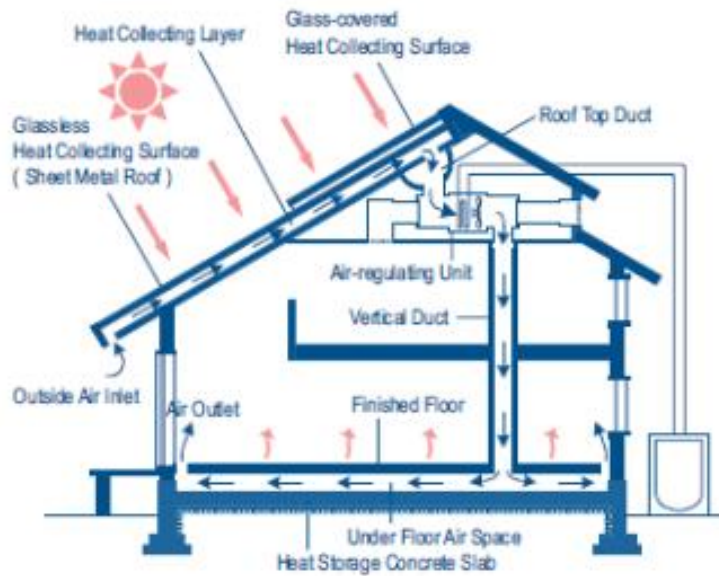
The OM building concept in Japan with BISTS roof and warm air auxiliary heating system (Om Solar, 2014)
